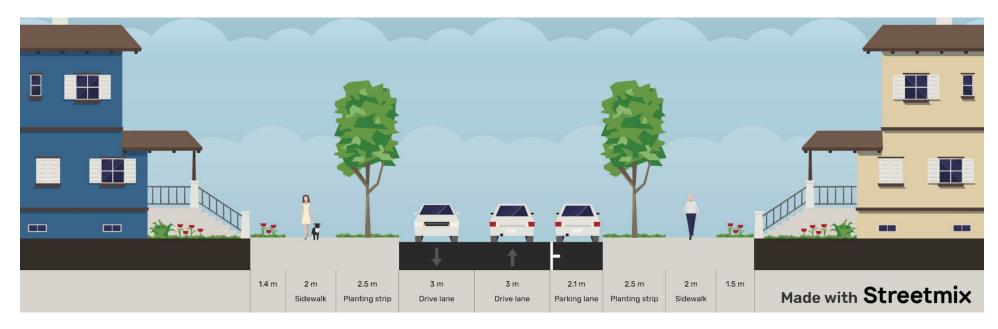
Local Road (20 m Right-of-Way) – On-Street Parking (One-Side)
